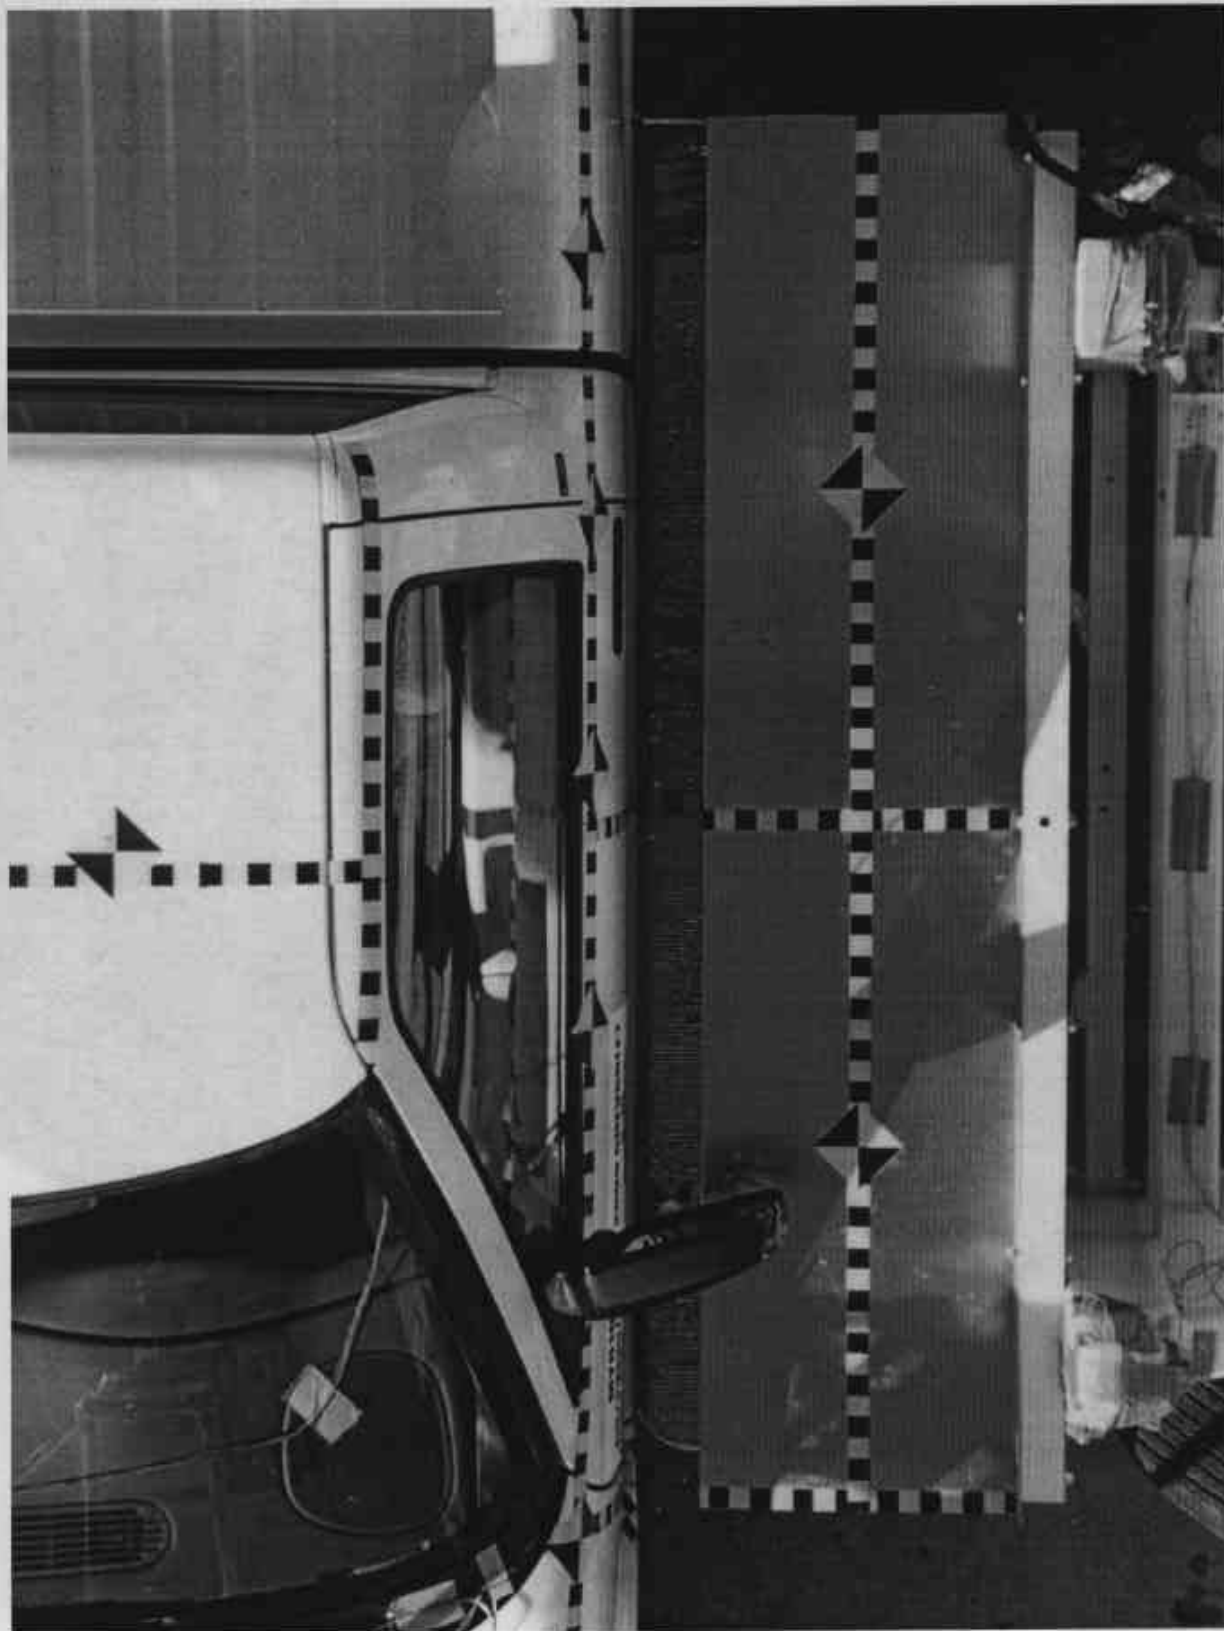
PRE-TEST OVERHEAD VIEW (AT IMPACT POSITION)
